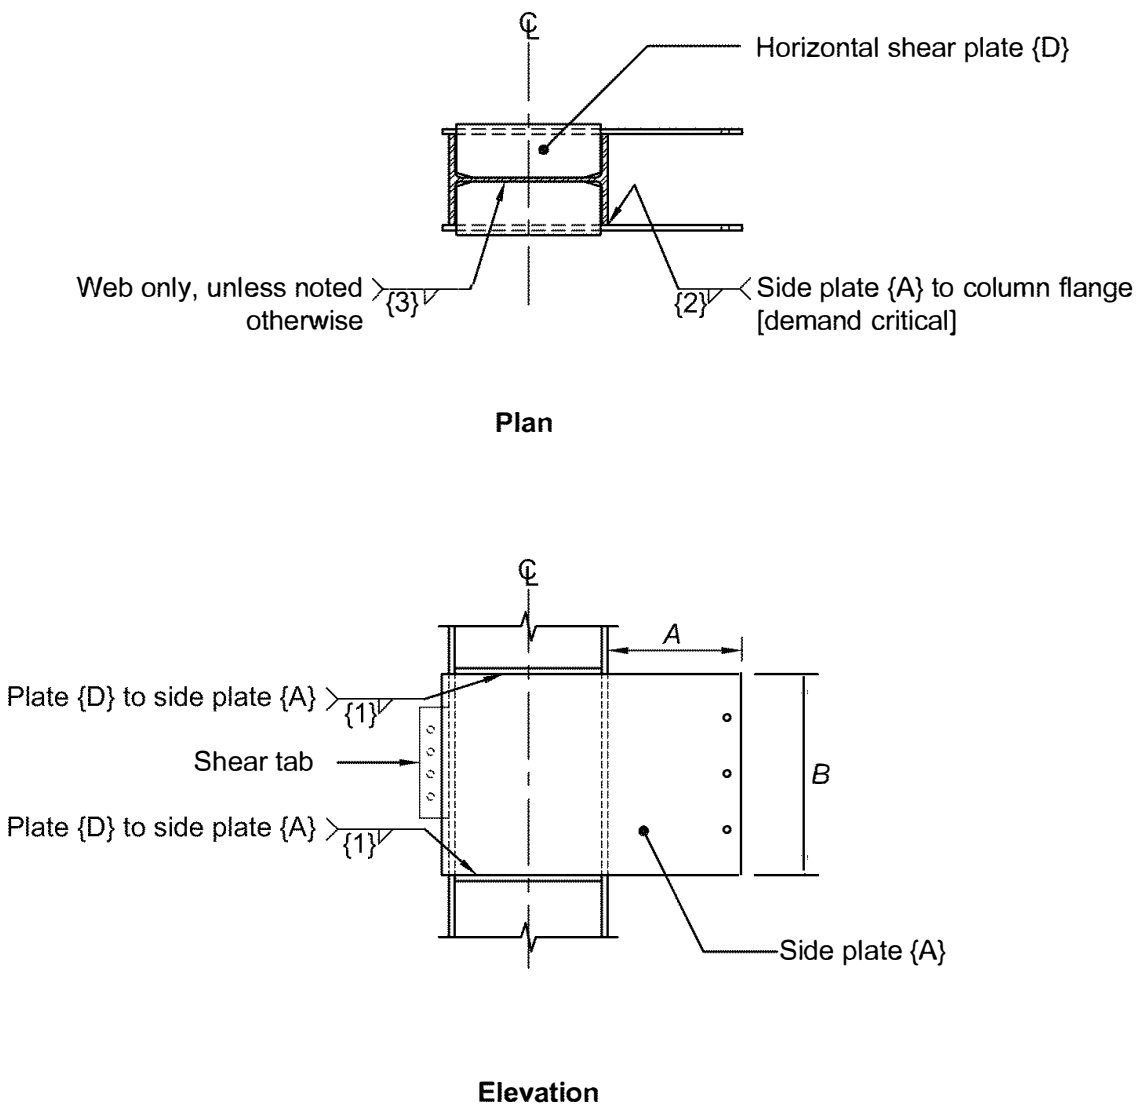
One-sided SidePlate moment connection (A-type), column shop detail.
